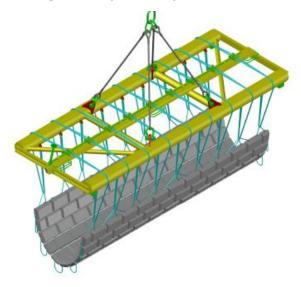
Representative Schematic of a Concrete Mattress Installation Using A-Frame Lift (Figure provided courtesy of Orsted/Seaway7/Subsea7)
